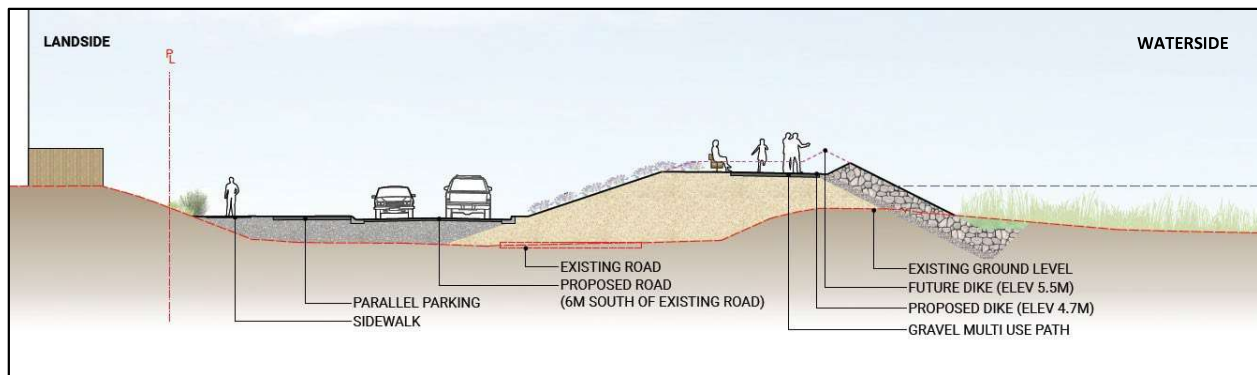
Alternative 2 Concept – Reduced Raising of Road and No Paved Bike Lane
